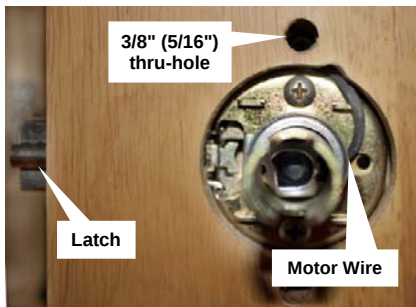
A: MOTOR WIRE IS ALWAYS LOCATED FURTHEST FROM LATCH
